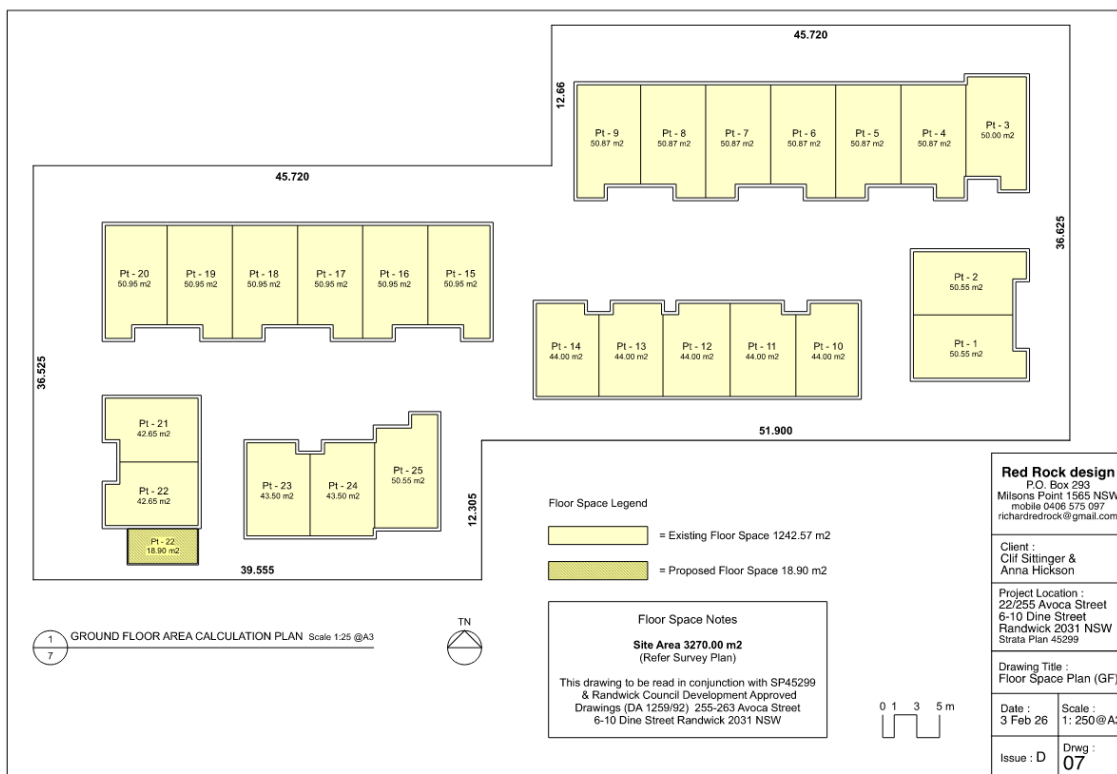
Ground floor Calculation Plan (Source: Red Rock Design).
